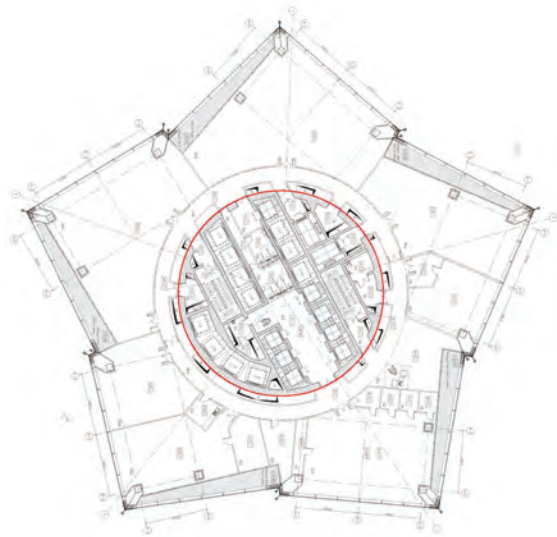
Core wall plan (Source: Peyman Askarinejad)
